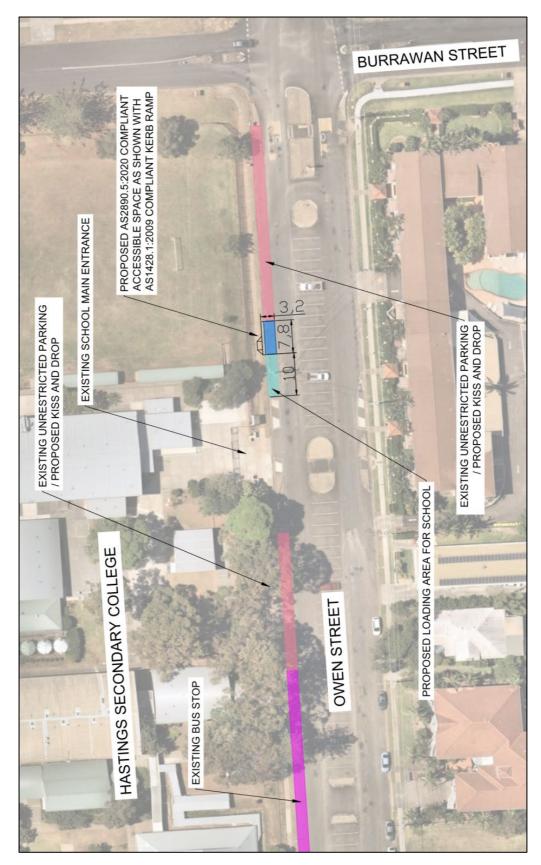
Proposed Modifications to On-street Parking – Owen Street, between Gordon Street and Burrawan Street
